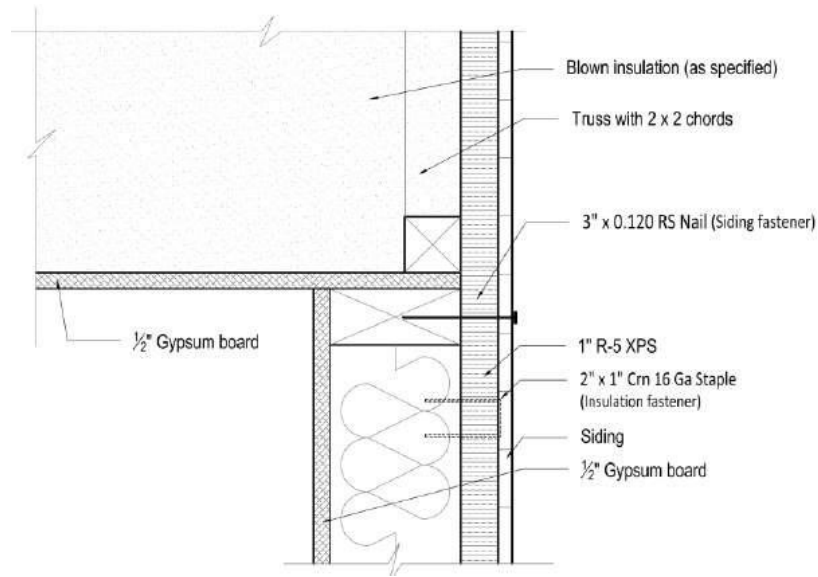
through Figure B-3 shows construction details and how the exterior continuous insulation is incorporated into the wall assembly.
